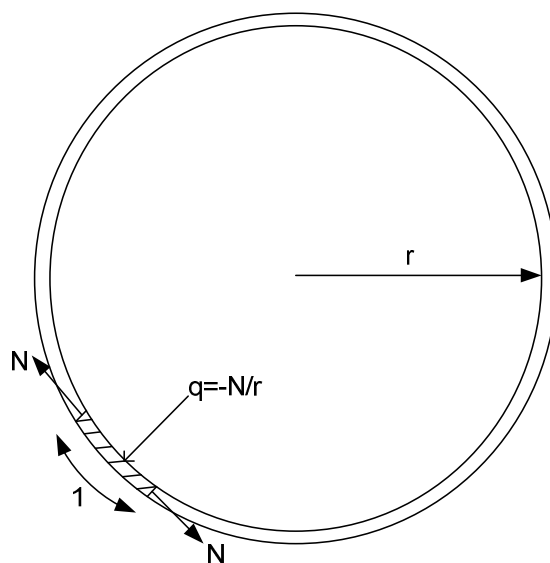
Plan view of circular tank used in Ghali (1979)
